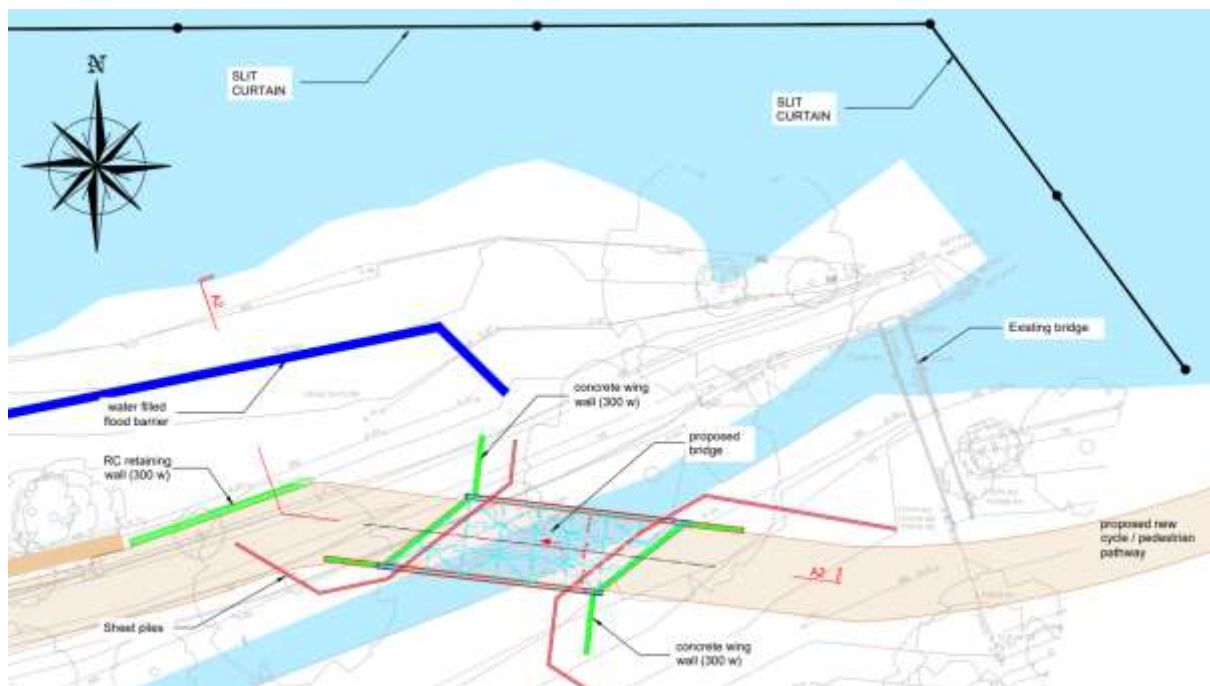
Plan of proposed Bridge 5 and proposed Ramp, showing proposed Silt Curtain, Sheet piles and water filled flood barrier (refer to drawing RHA-XX-DR-S-SP0052)
